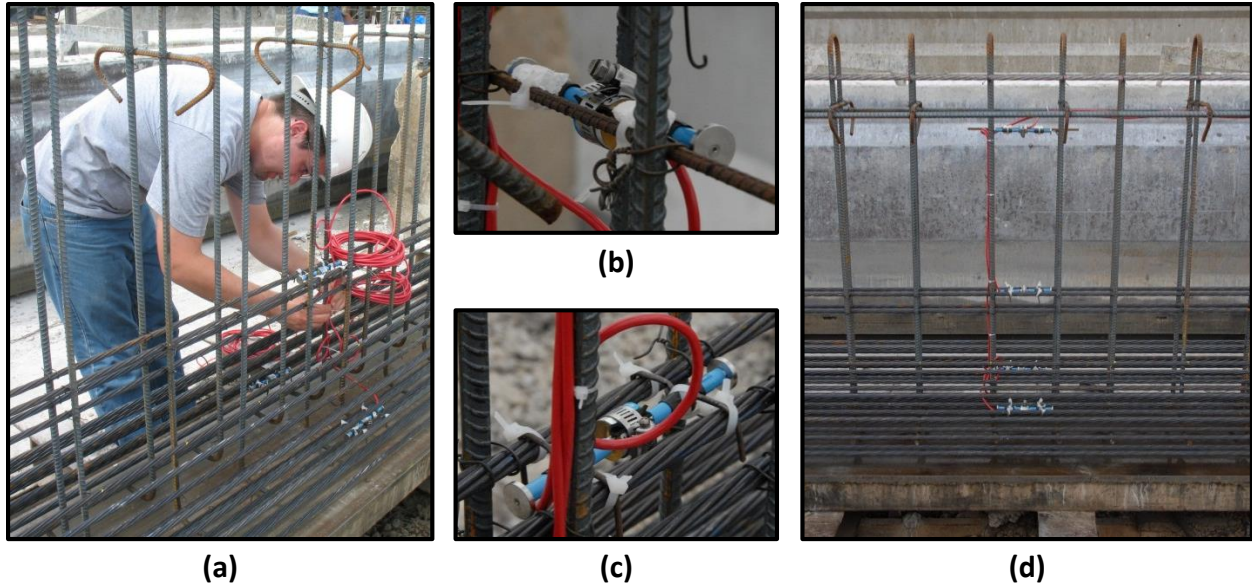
Vibrating wire gage installation: (a) cable routing, (b) gage supported by auxiliary reinforcement, (c) gage supported by a strand, (d) midspan distribution of gages
